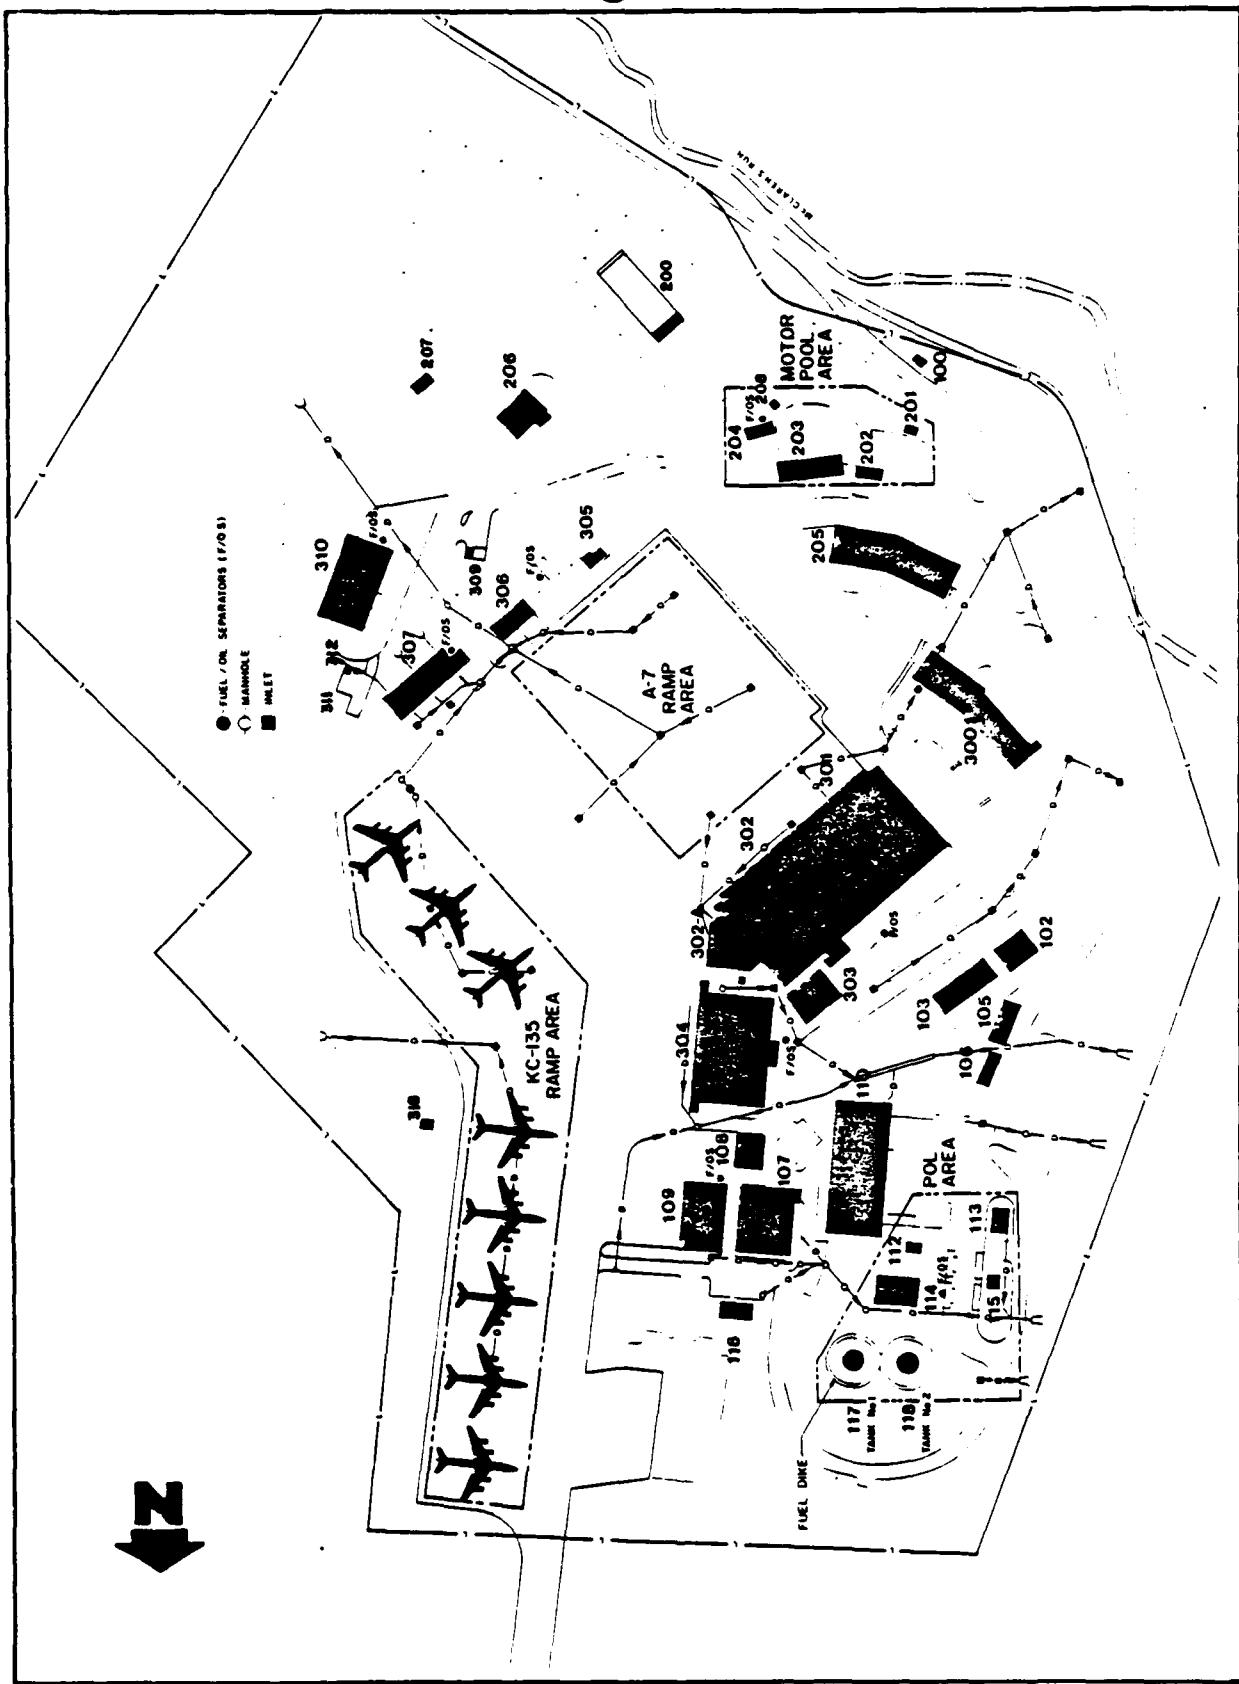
SURFACE DRAINAGE ANG FACILITY
